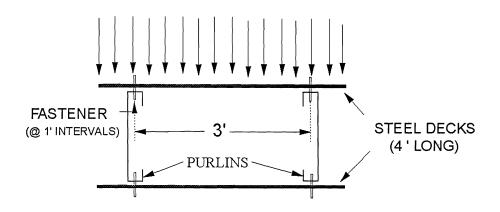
Cross section view of bracing system for experiments braced on the top and bottom flanges.
